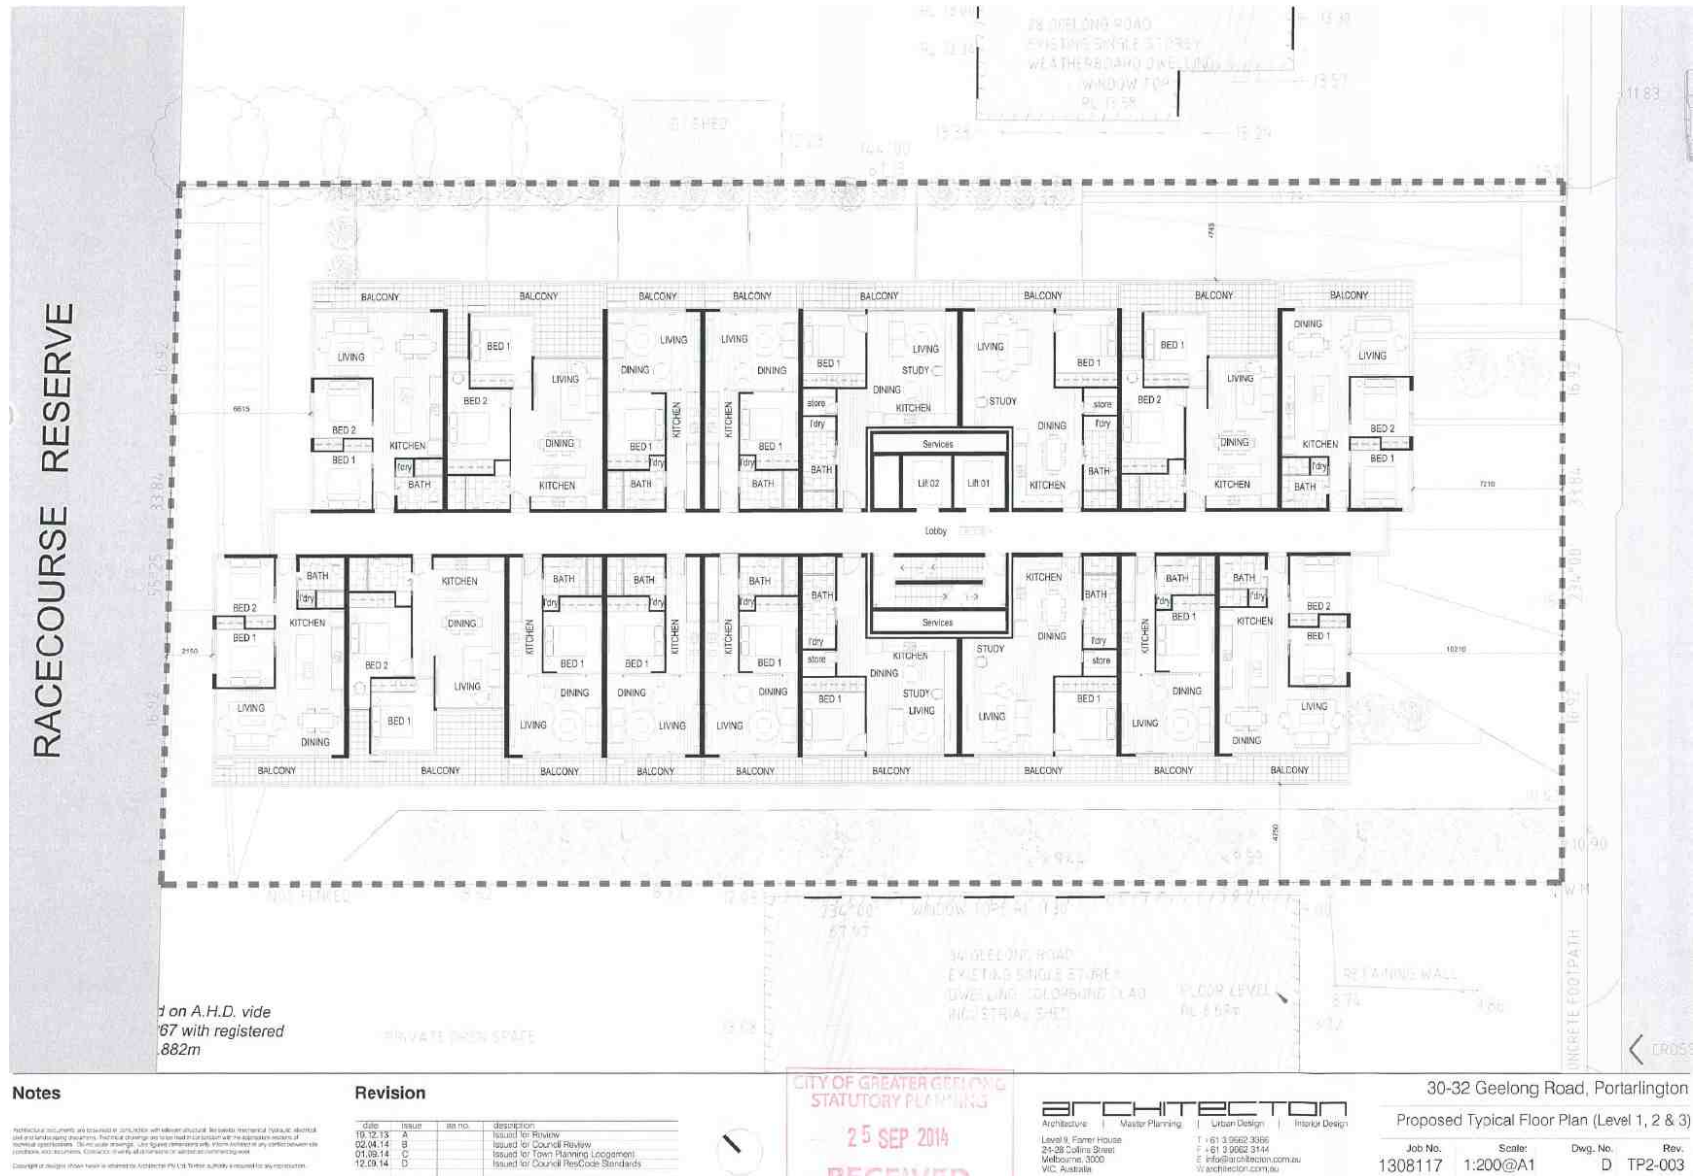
Proposed Residential Floor Plan, Levels 1, 2 & 3 – 30-32 Geelong Road Portarlington
